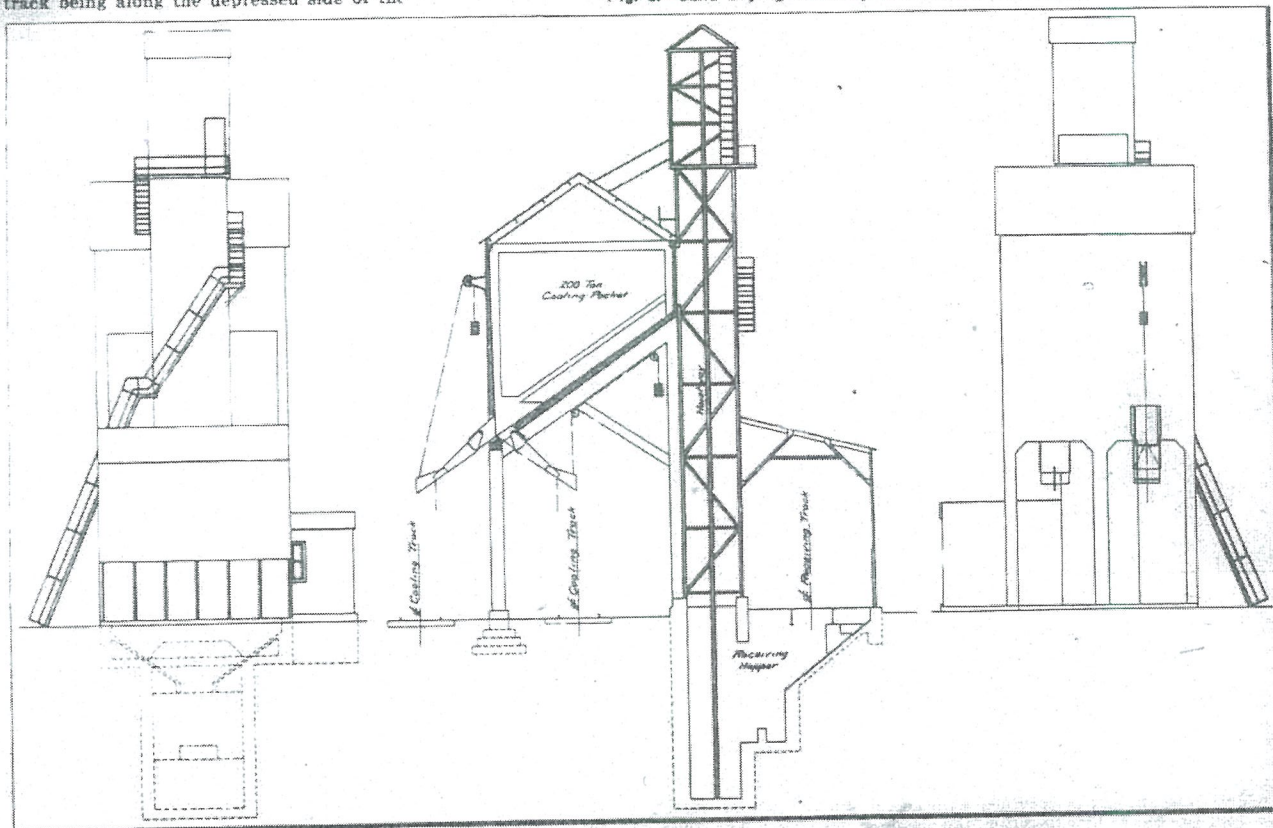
Typical Coaling Plant on the National Transcontinental Ry., Six of Which Are Being Built.
